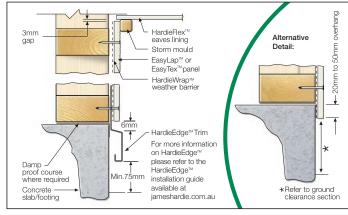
SLAB/EAVE JUNCTION DETAIL
